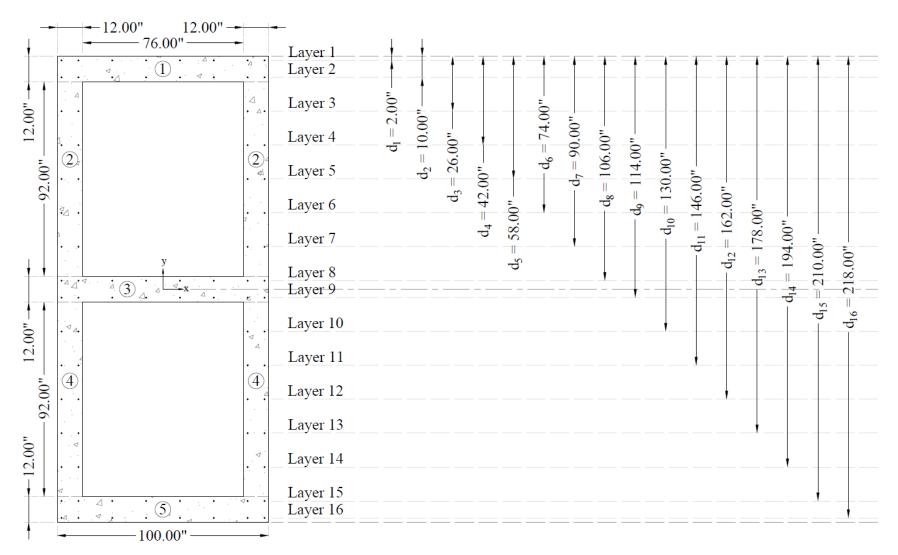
Reinforced Concrete Core Wall - Cross-Section and Reinforcement Design Data
